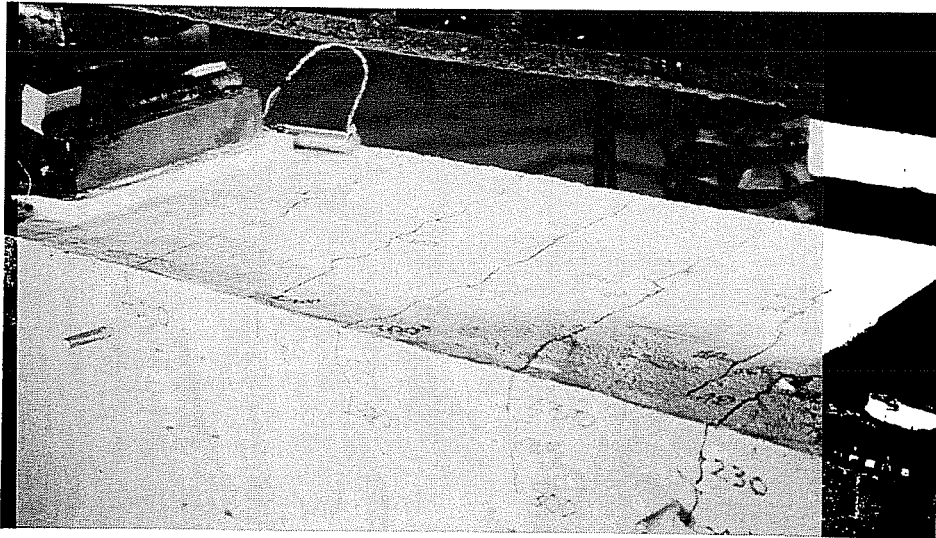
Crack Distribution at the Top of Pier A1-1 After Failure
